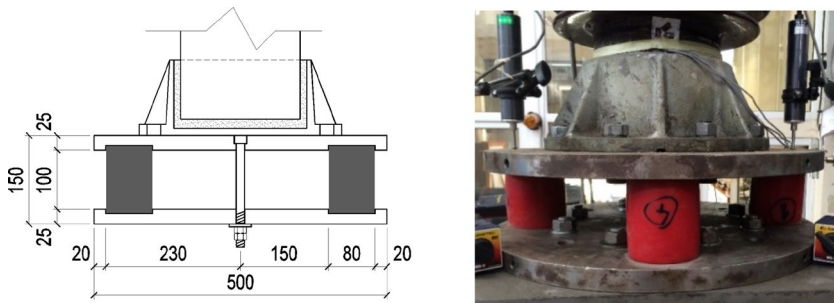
Typical sectional dimensions (in mm) and photograph of PSID
